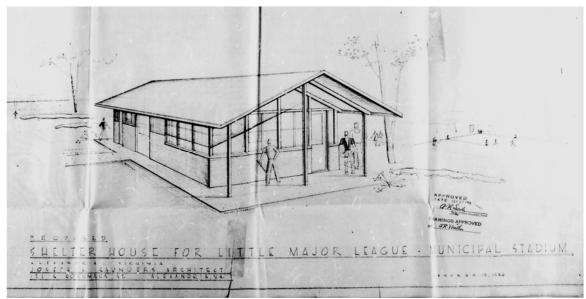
Original façade of the Shelter House, constructed ca. 1954 (City of Alexandria Building Permits)
